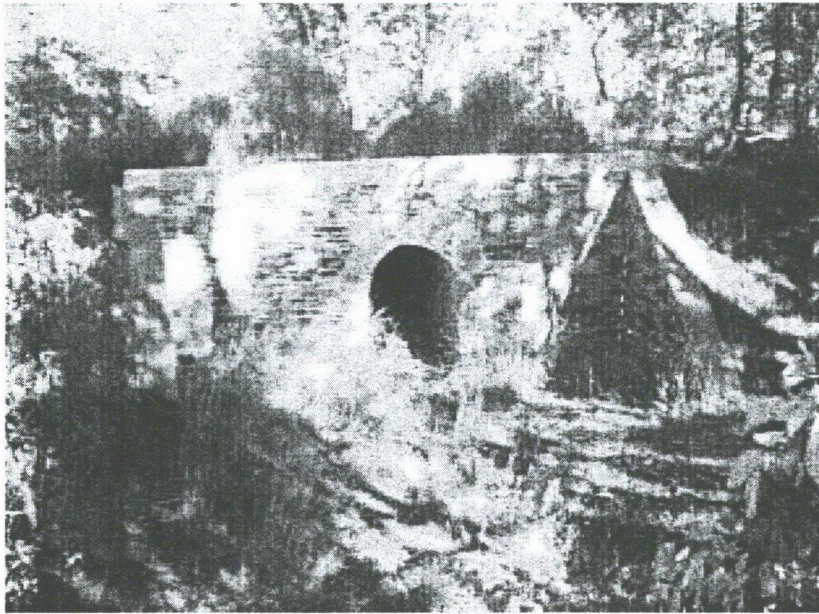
Culvert 3, looking southwest. Arch height 2.14m and width 1.61m.
